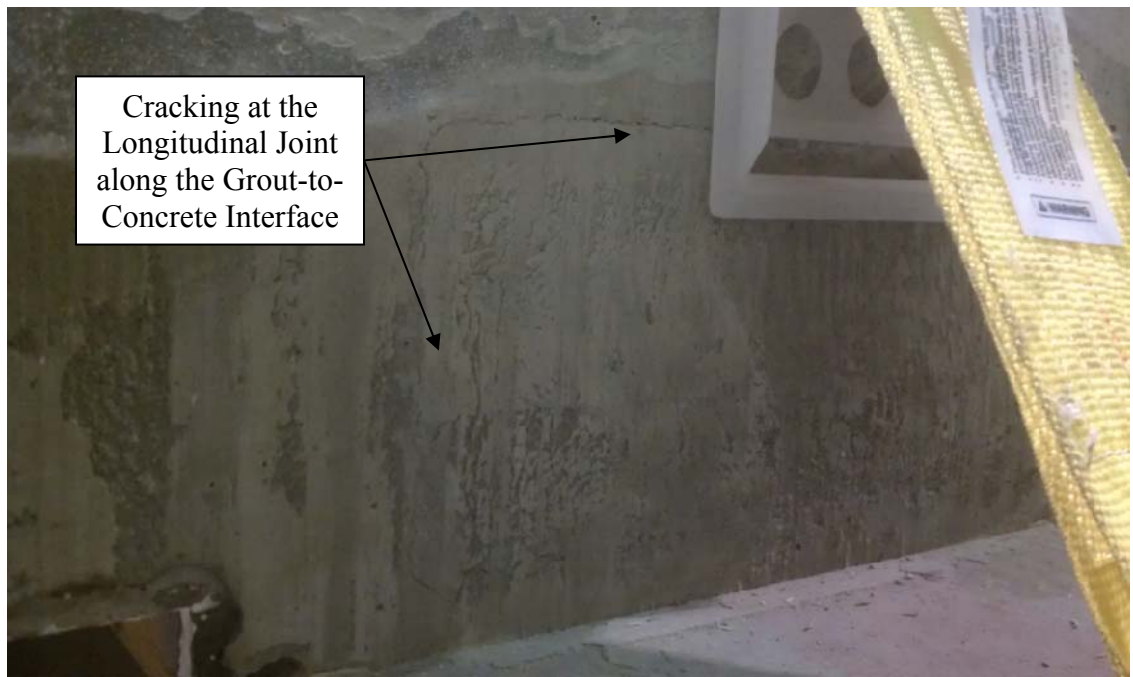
Minor Cracking at Longitudinal Joint Grout-to-Concrete Interface
